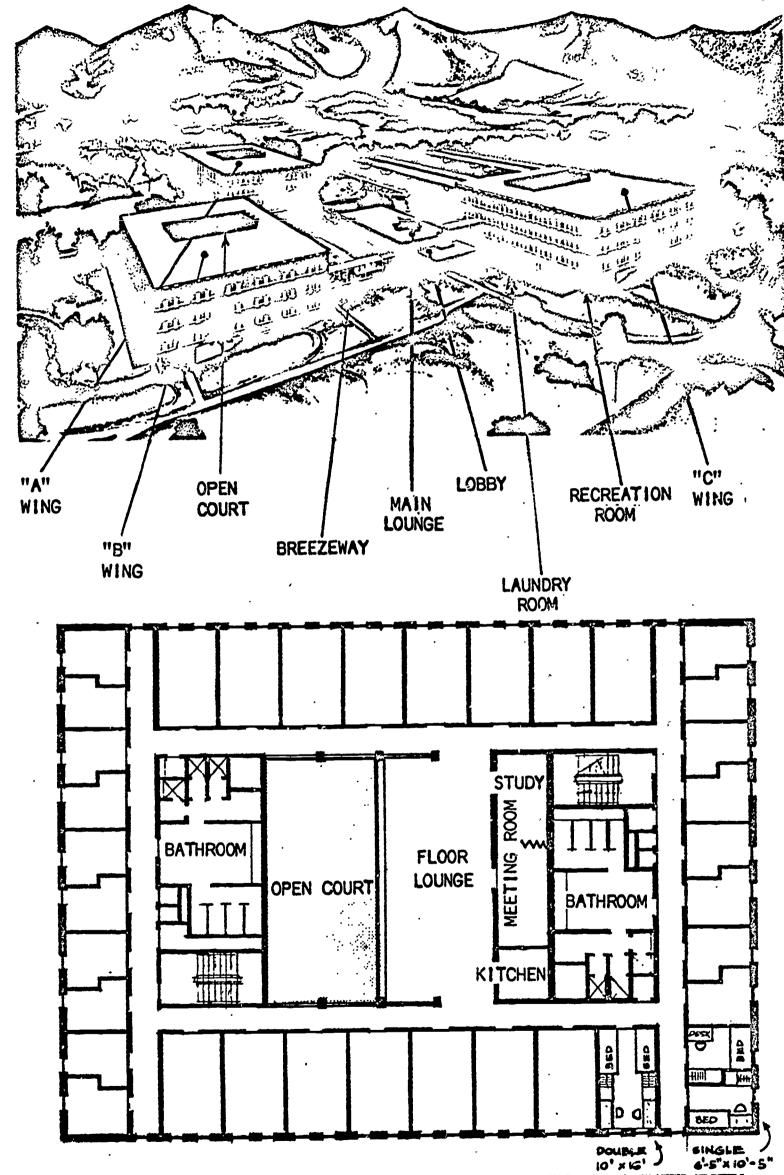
Perspective View and Floor Layout of Austin Hall.
